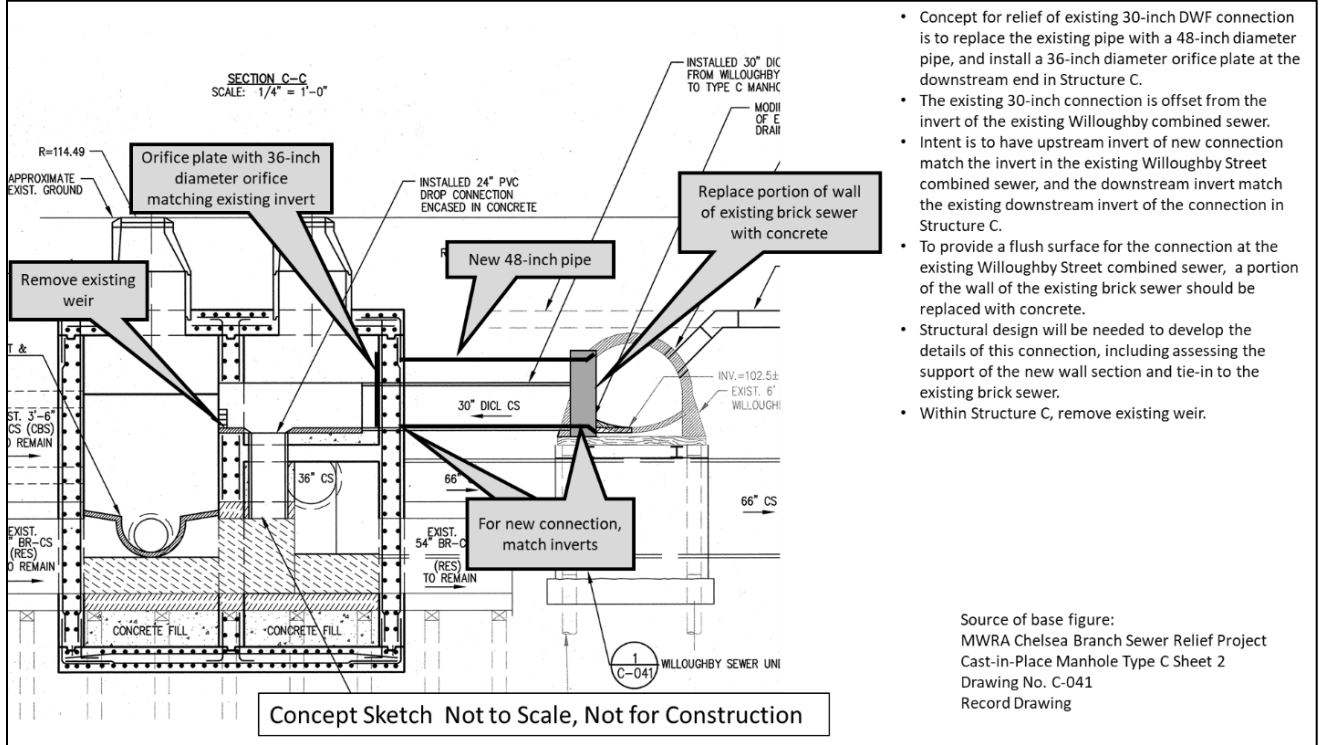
Sketch Section View of CHE008 Proposed DWF Connection
